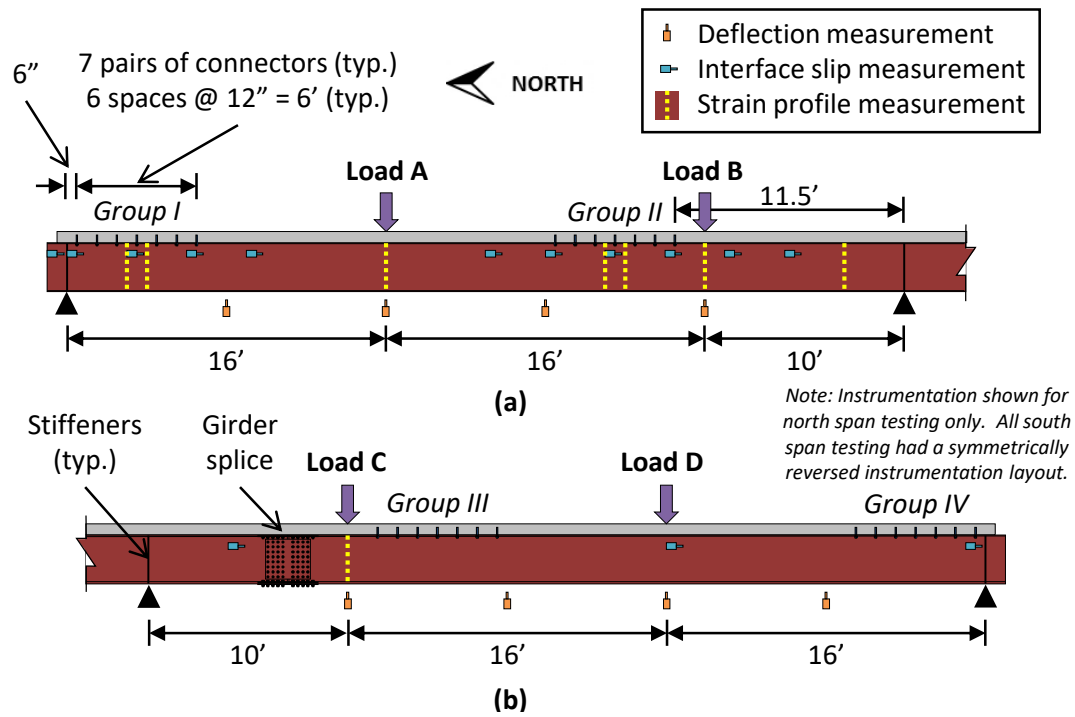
Elevation View of First Specimen – (a) North Span and (b) South Span
